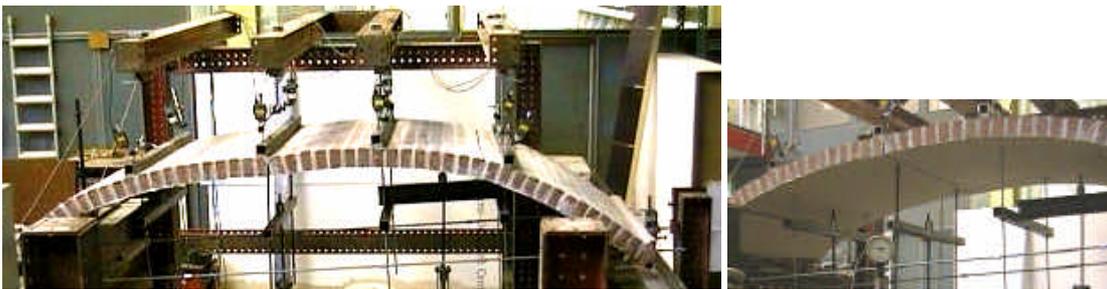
Deformed arch almost at the end of testing, and crack beneath largest load, position 2, test R1
